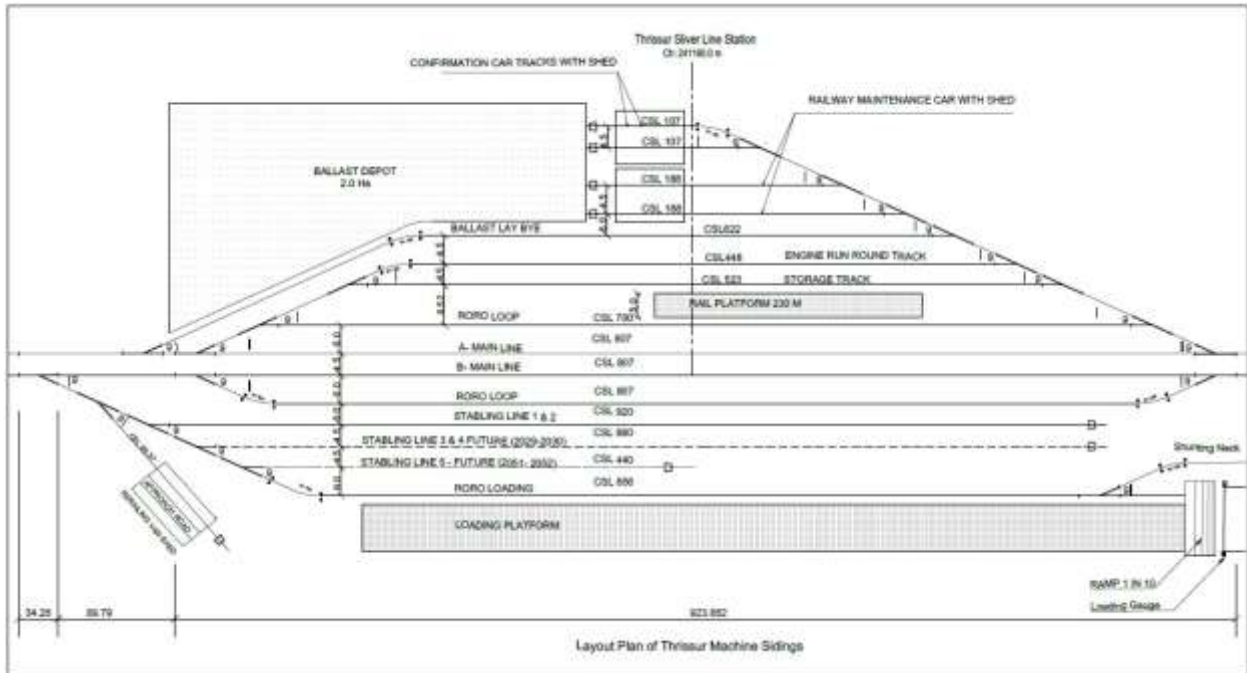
A sketch showing the Machine Siding proposed at Thrissur RORO
